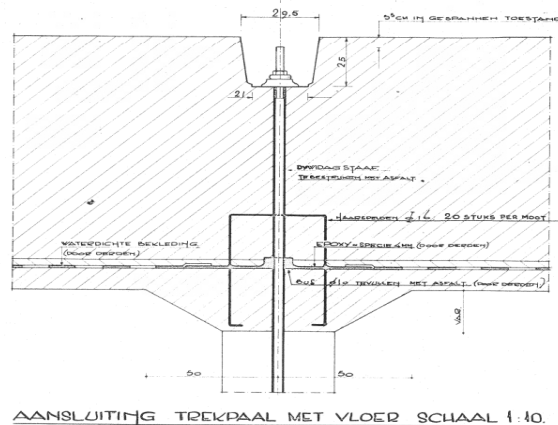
TENSION PILE CONNECTION TO TUNNEL FLOOR (TEK HE759, 1962)
